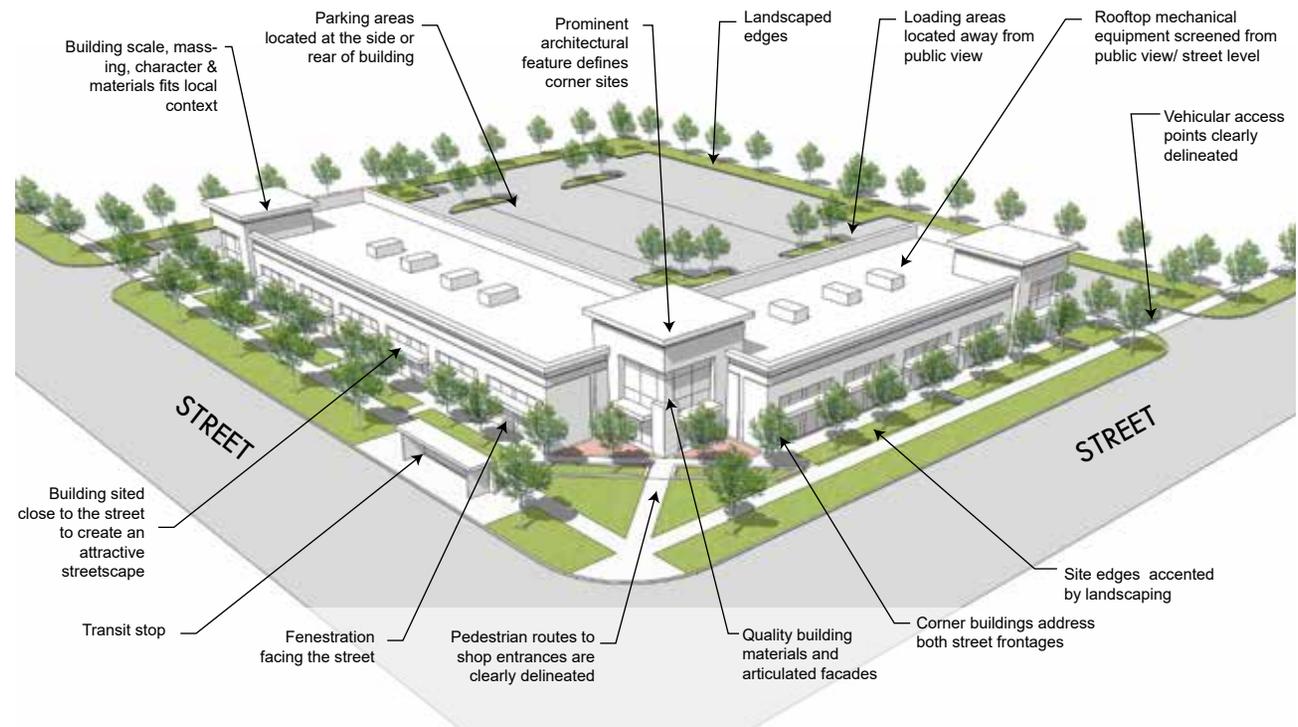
Conceptual Demonstration Plan For Commercial Site
